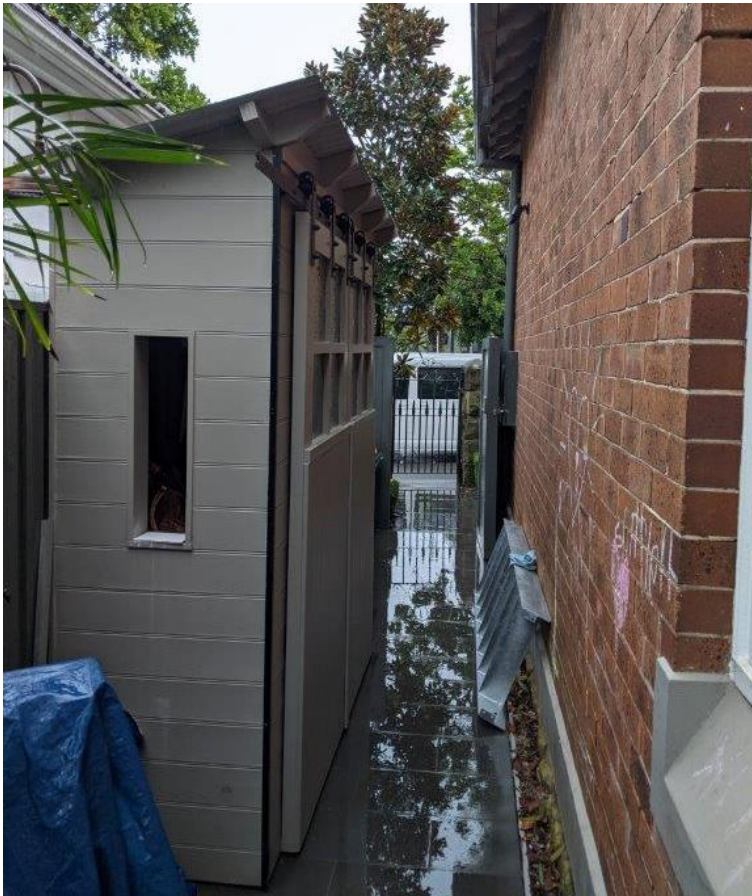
View from the side of the house looking towards the front with the storage element located behind the side gate. The unit is not shown on the existing and proposed plans DA//05 & 06.
